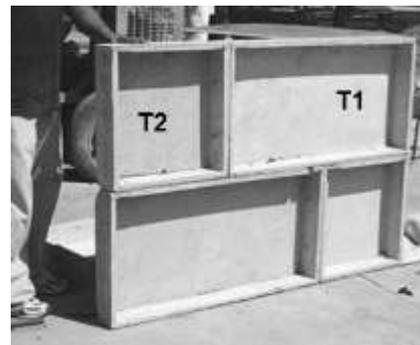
Wall section assembled with prefabricated elements T1 and T2.
